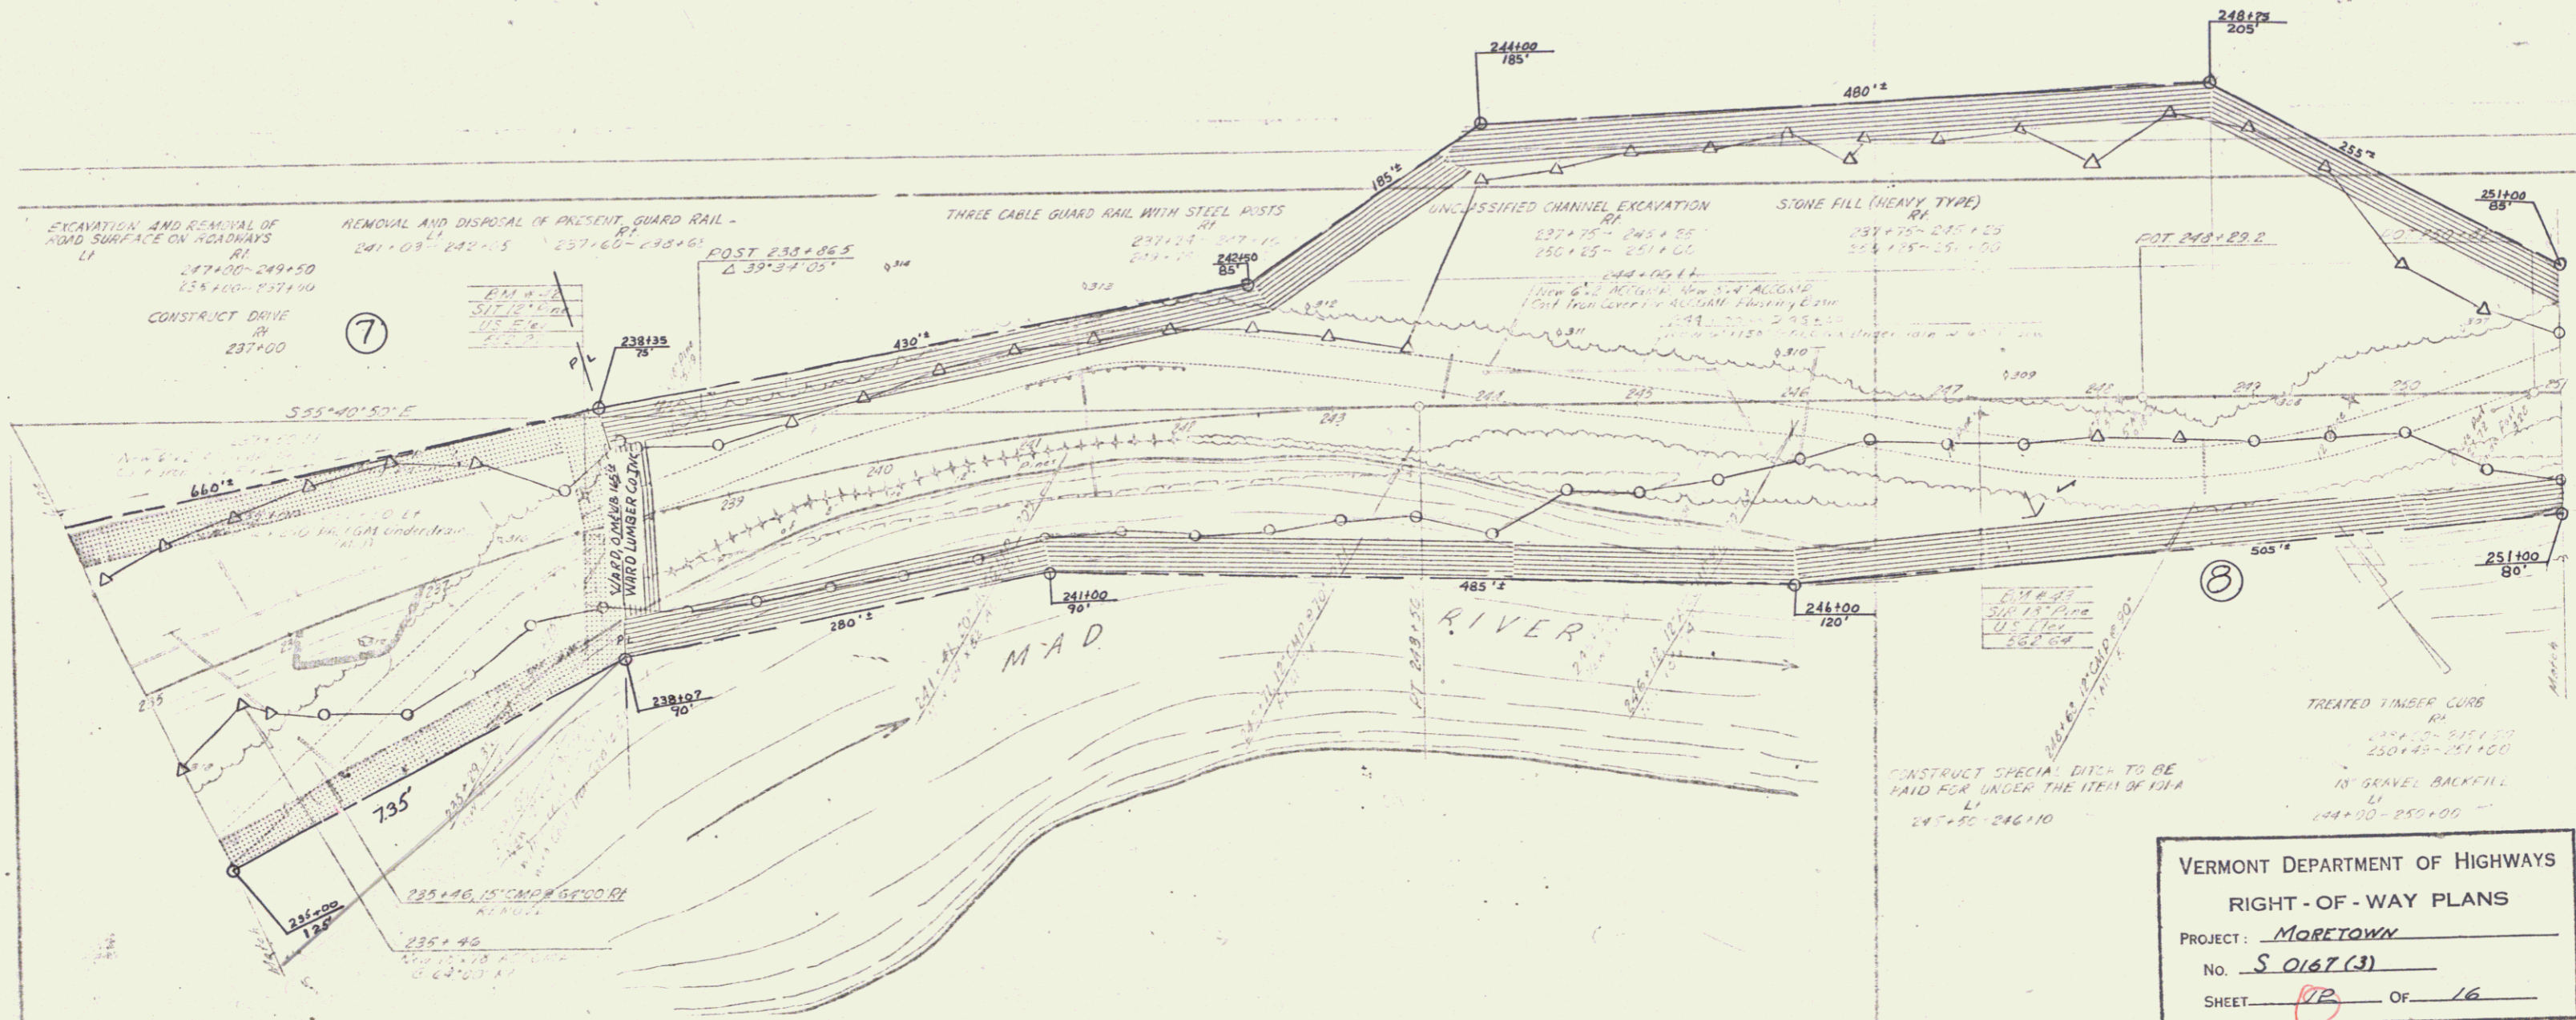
PLAN, PROFILE, G.A.P. & E. DRAWING
